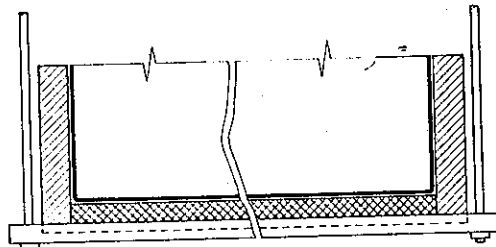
Rectangular duct - insulated and vapour sealed to Method 2.
